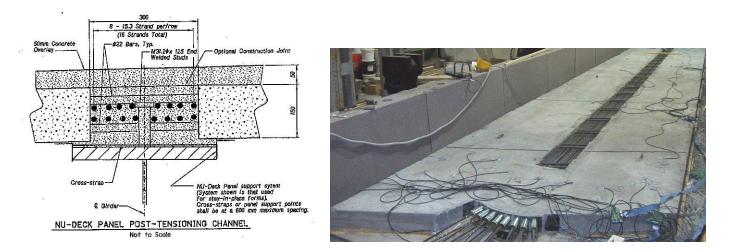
Longitudinal post-tensioning concentrated at girder lines used on the Skyline Drive Bridge, Omaha, Nebraska
